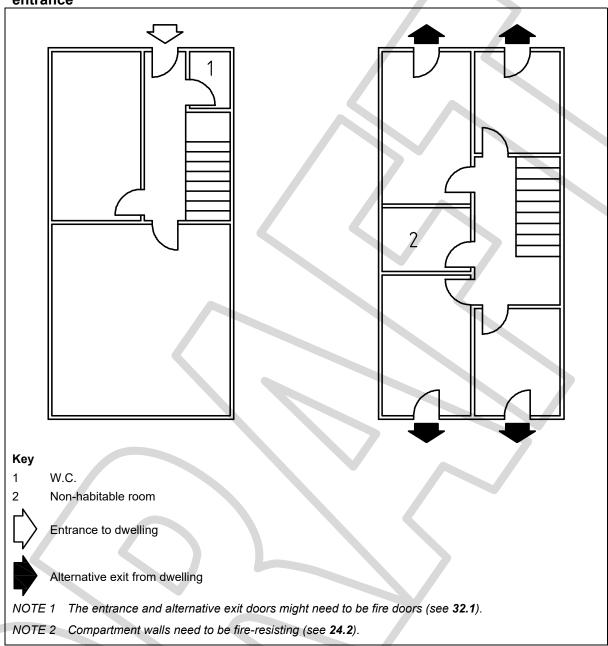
Dwelling with alternative exits from each room not on the floor of entrance
